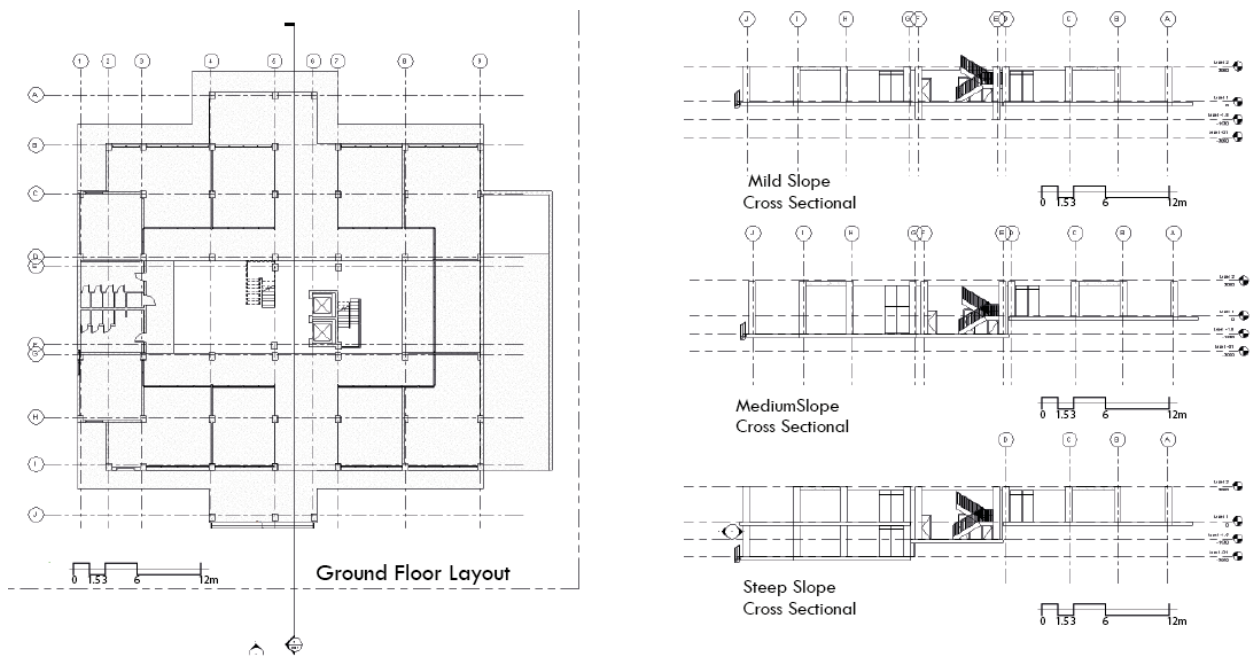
Ground floor design options for varying cross sectional slope conditions (Sections)
